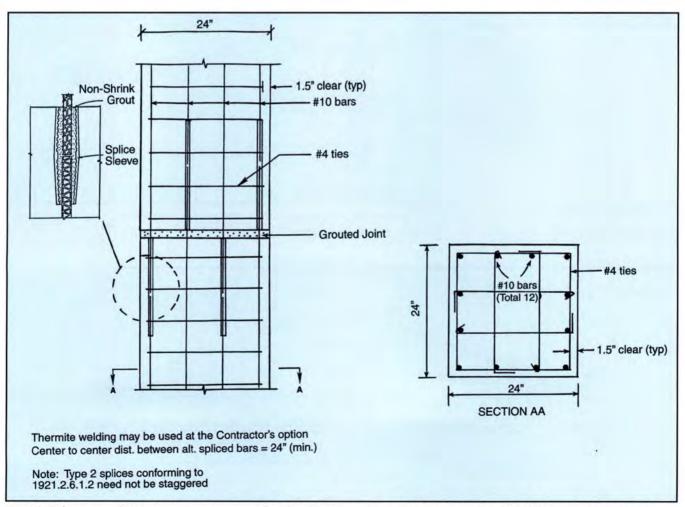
Column-to-column wet connection at midheight of interior column between second and third floors, forming part of interior longitudinal frame.
